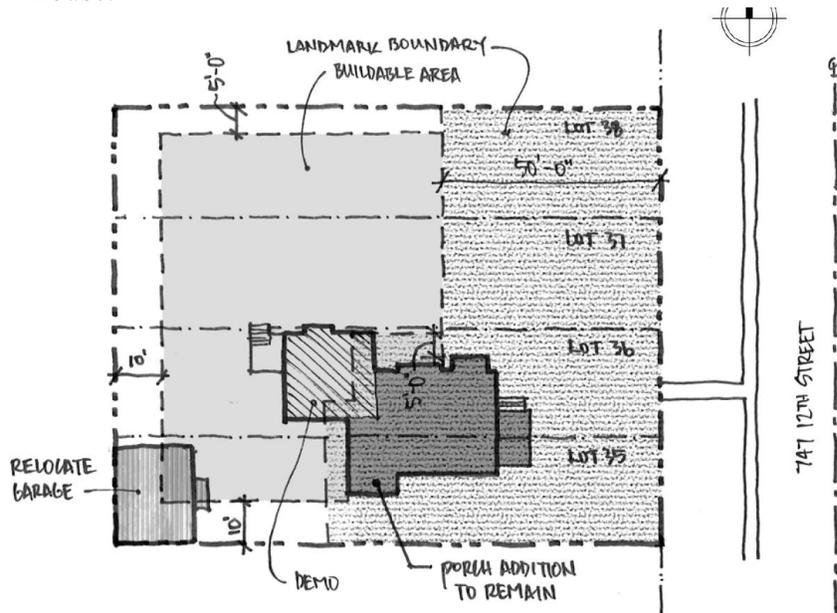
Applicant’s Proposal #1: Addition to Historic Building.
